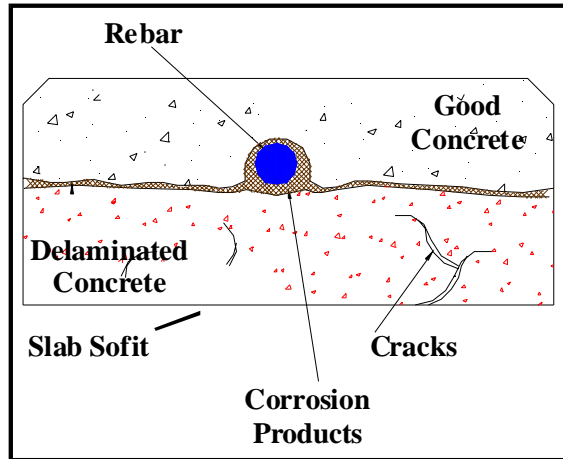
A typical cross-section of concrete slab of ceiling of underground parking garage (cracks and other openings may contain ice lenses).
